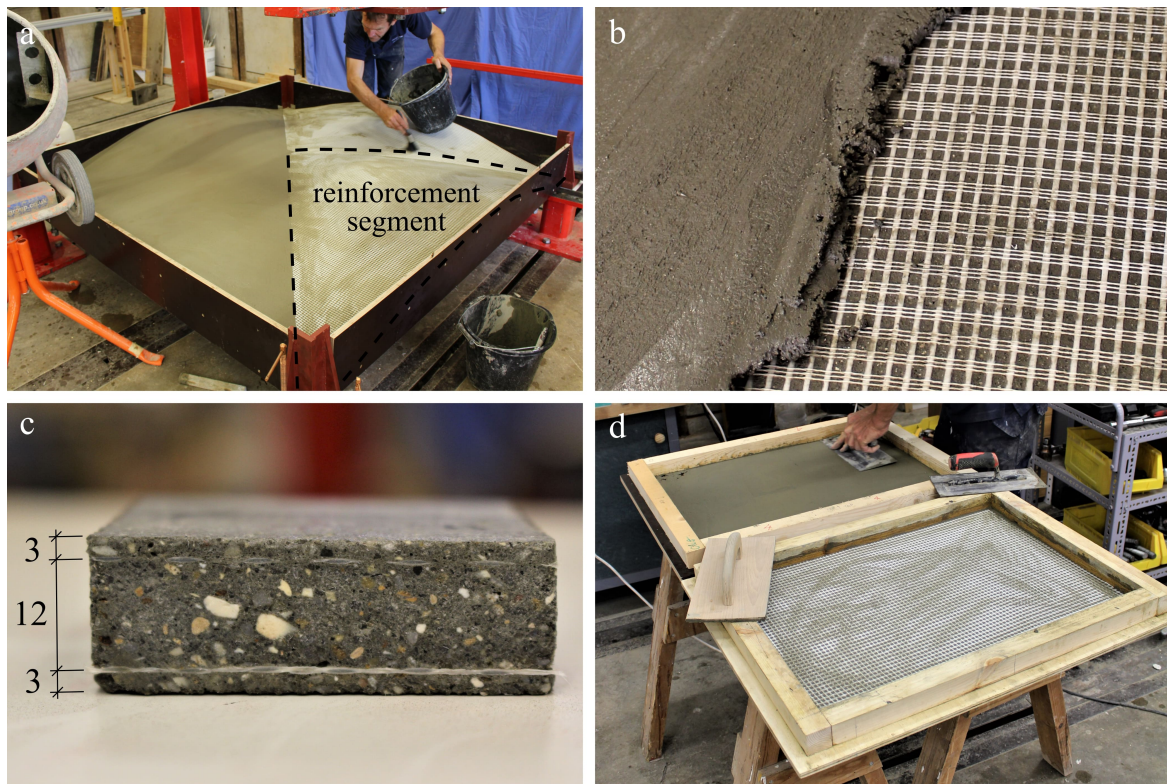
Construction of the TRC concrete shell, showing a) the application of a reinforcement layer, b) detail of the reinforcement and fine-grained concrete, c) TRC cross-section and d) construction of flat TRC panels for strength testing.
